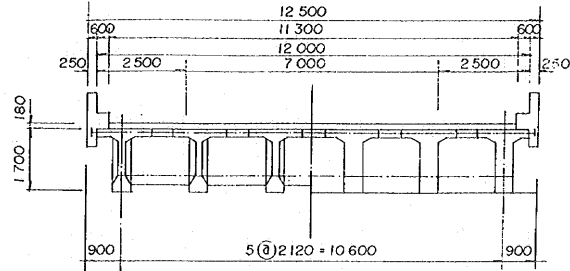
Bridge on Arroyo Tebicuary-mi (No.25, Bailey Bridge)
